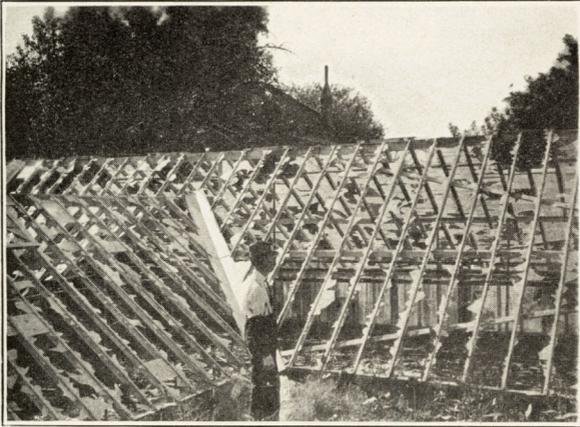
Lehi Floral Co.'s greenhouse, north slope (at right) and west slope (at left), after hailstorm of August 9, 1920. Photo by Zelda Kirkham, Lehi, Utah.
